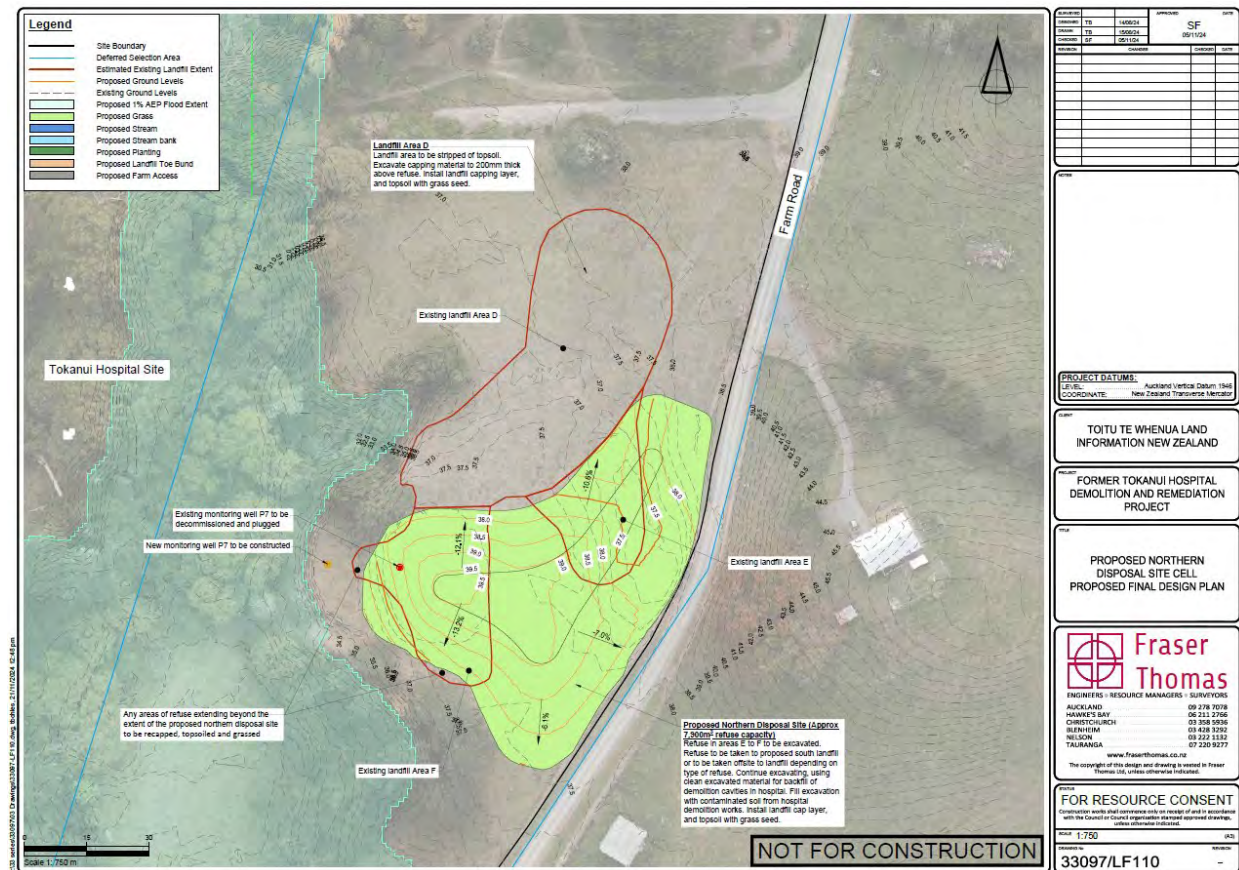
Proposed Northern Disposal Site Cell – Proposed Final Design Plan
